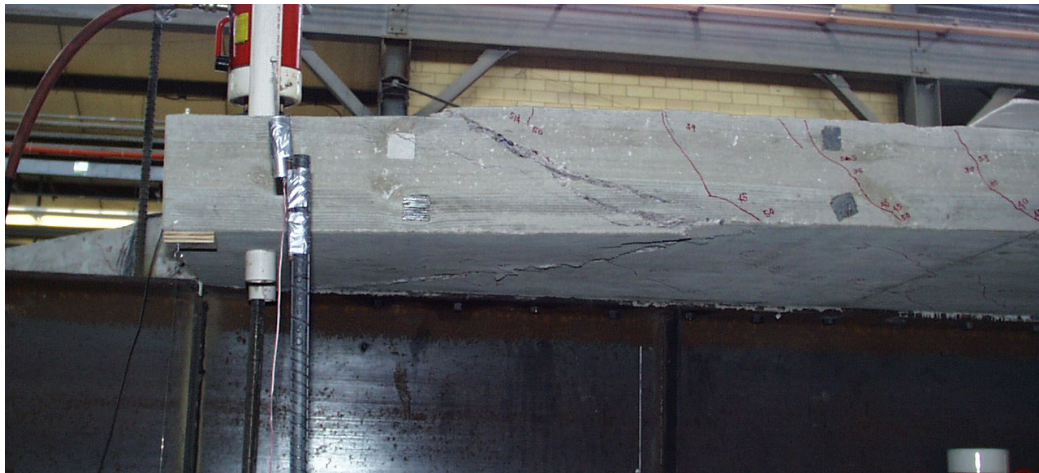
, Figure 6-35, and Figure 6-36 show the slab after failure. Although torsional cracking was most extensive in this test section, extending well into the south side of the deck, the shape of the failure surfaces indicates that this area failed in punching shear rather than torsion. The intersections of the failure surface with the top and bottom of the deck are parallel to each other, and indicate that a punching shear failure surface formed from the free edge of the overhang to the slab edge above the girder.
